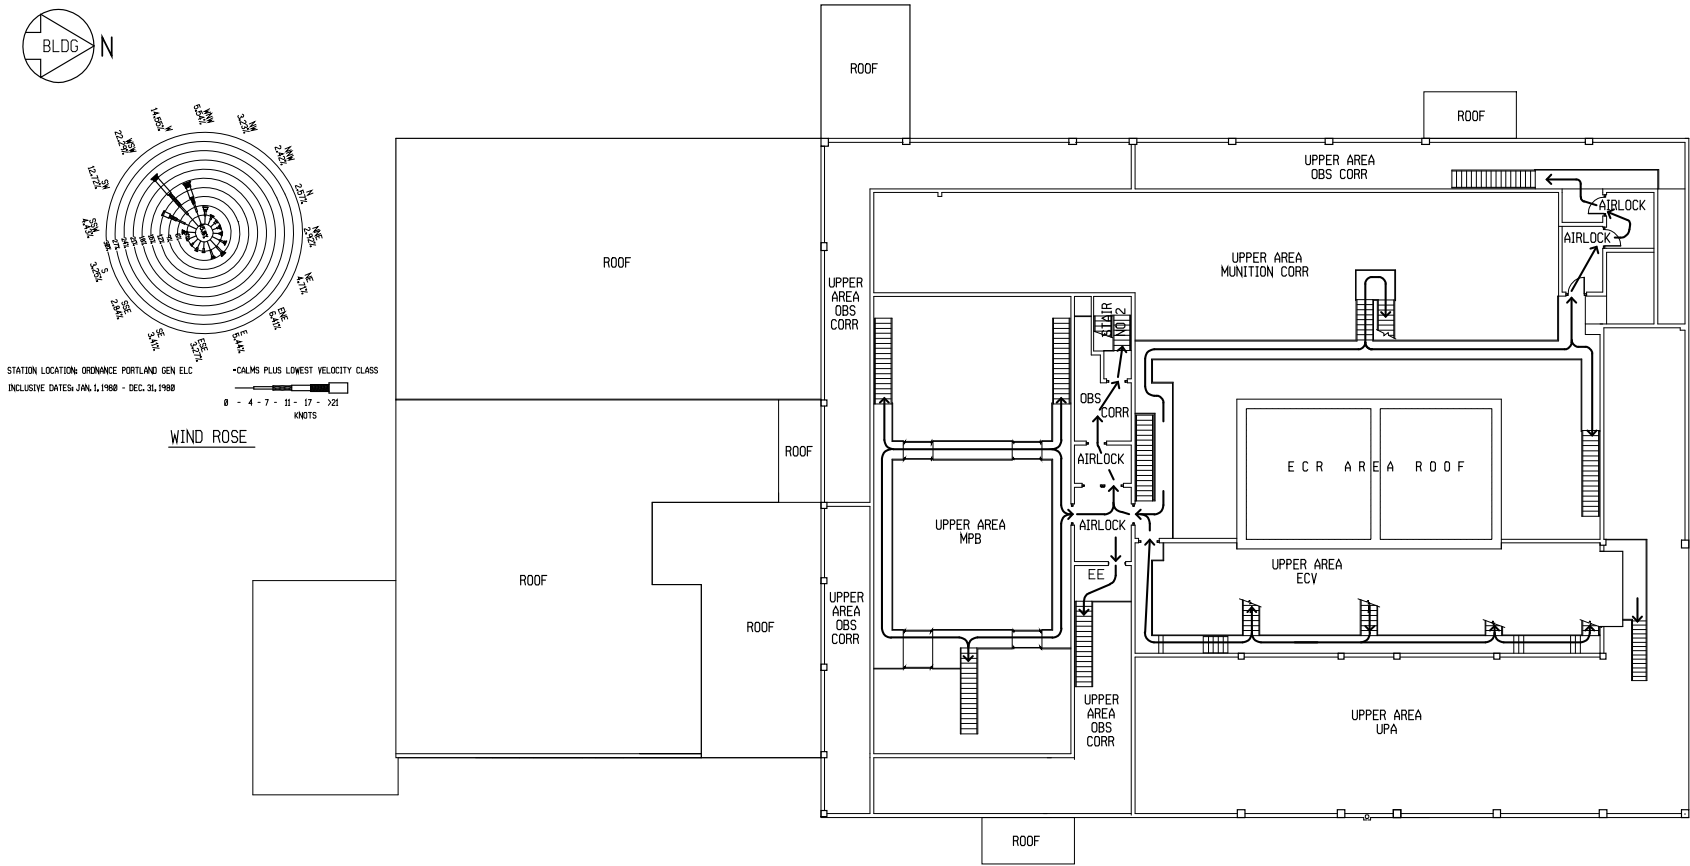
Second Floor Platform – Munitions Demilitarization Building Evacuation Plan
